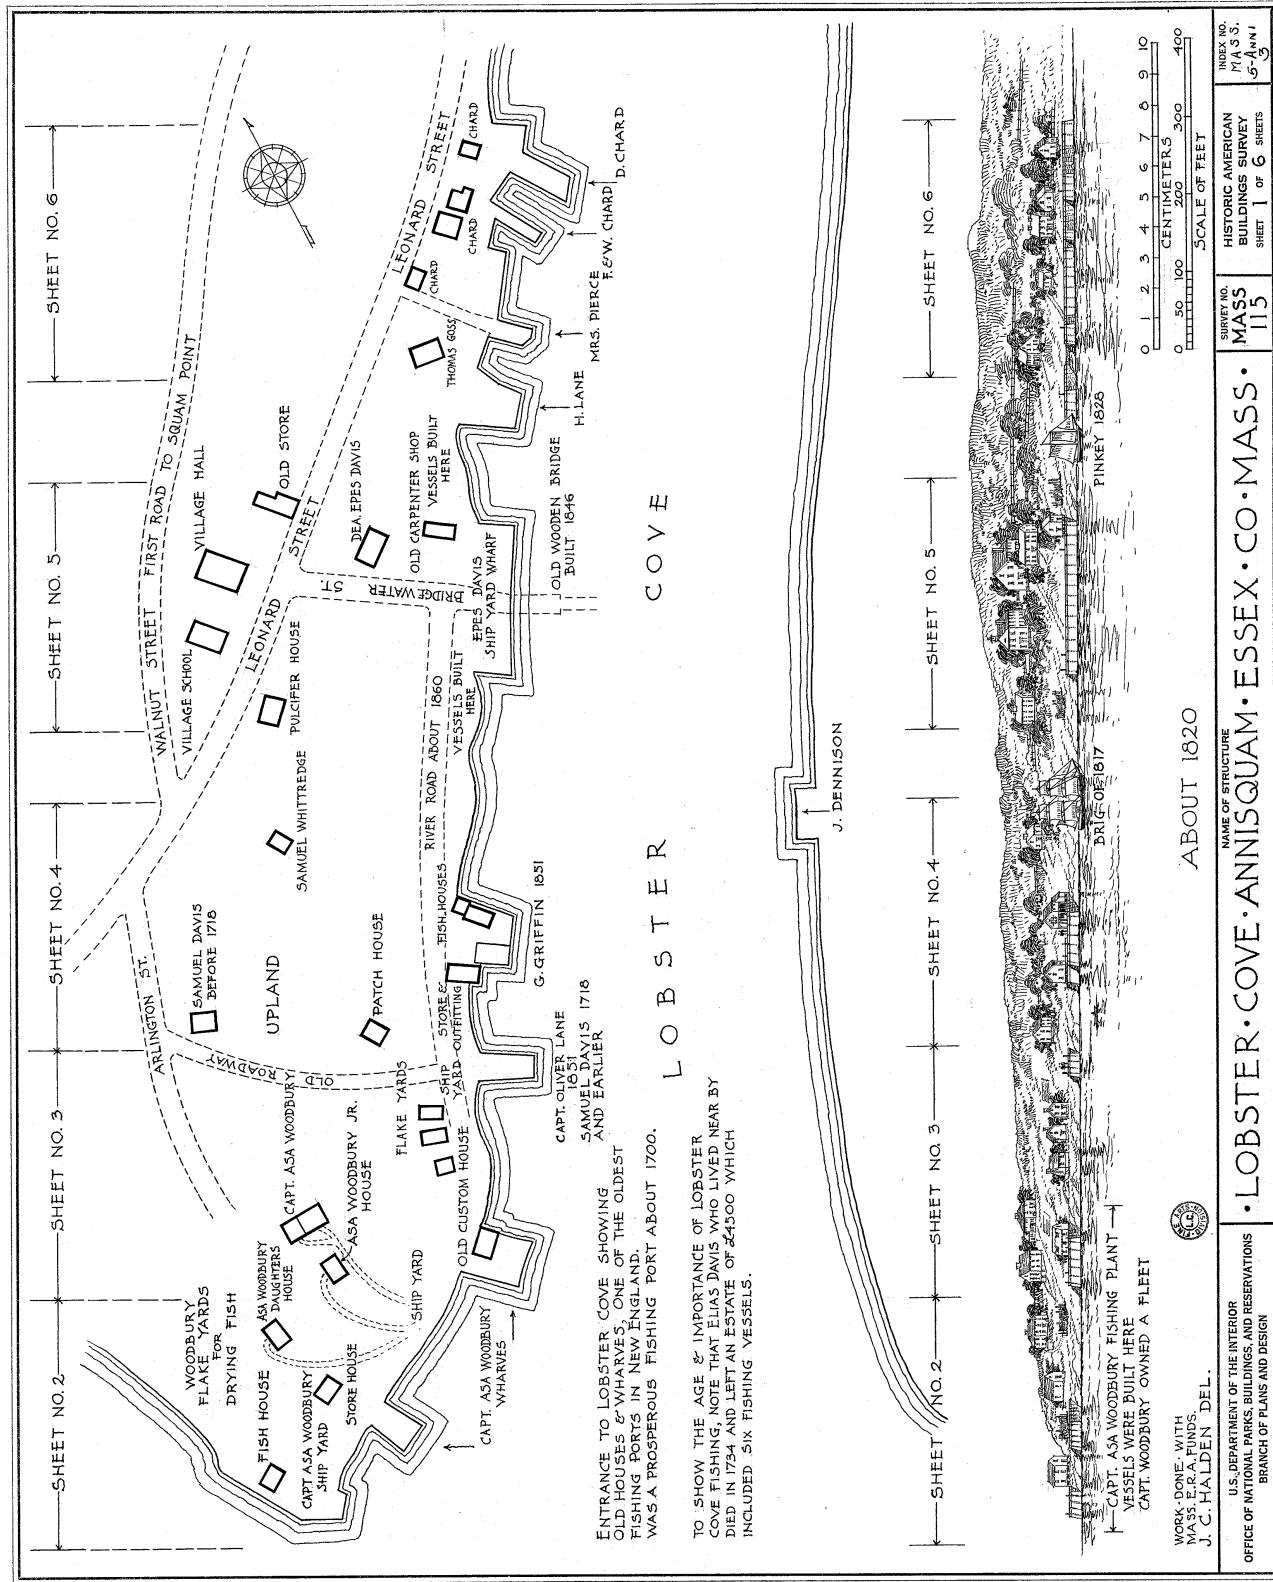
The complex cultural landscape of a fishing village with great integrity was captured through an overall elevation as viewed from the water and a general plan. Subsequent drawings as indicated in the plan include more detailed documentation. (HABS MA-115)
